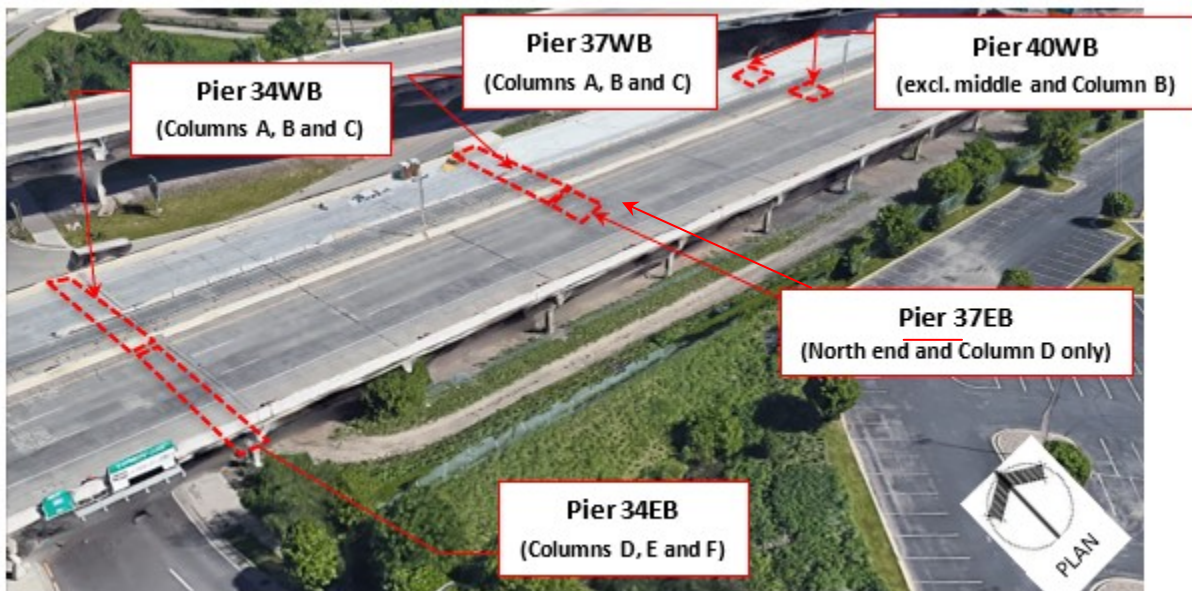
Aerial view of the portions of Bridge No. 27831 included in the 1998 study
